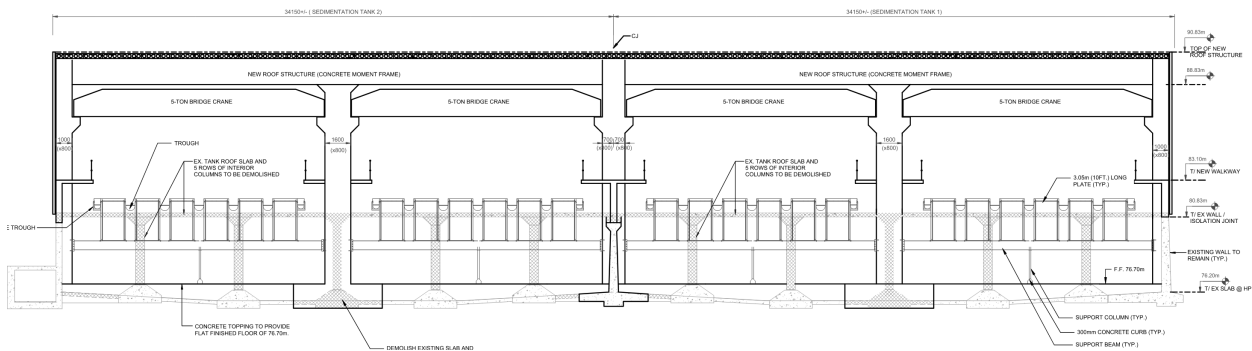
Proposed Sedimentation Tank Structural Works (Source: AECOM Conceptual Design, 2021)
